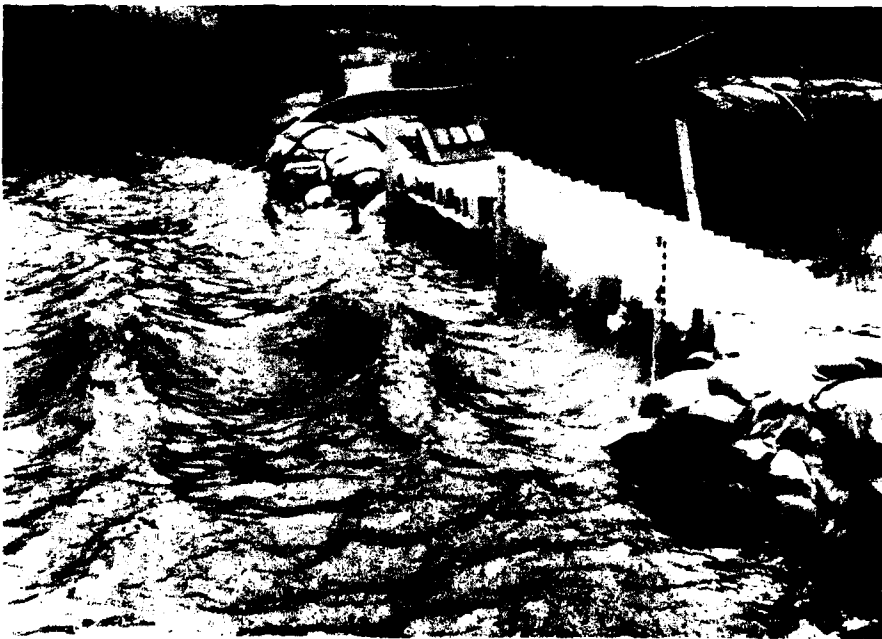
Riverside view of Section 4-2 during wave action at the 2.0-ft water level
